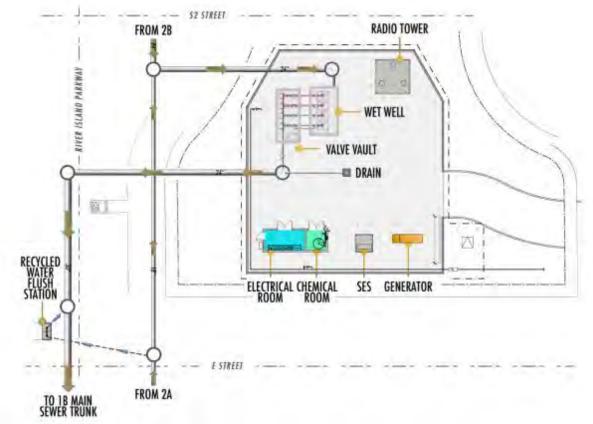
Collection Area Sewer Lift Station A1 Site Plan View
